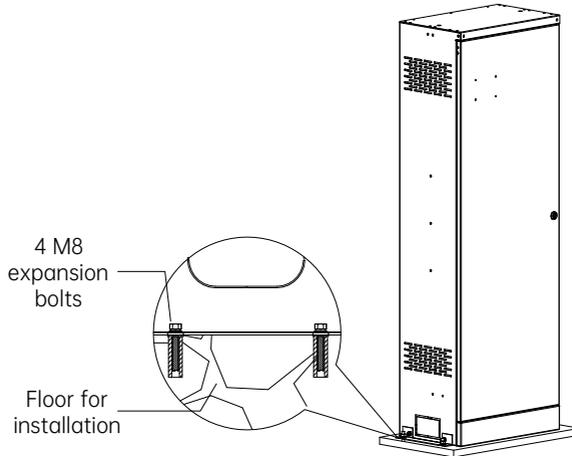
Diagram of floor-mounted installation and fixing of the cabinet
